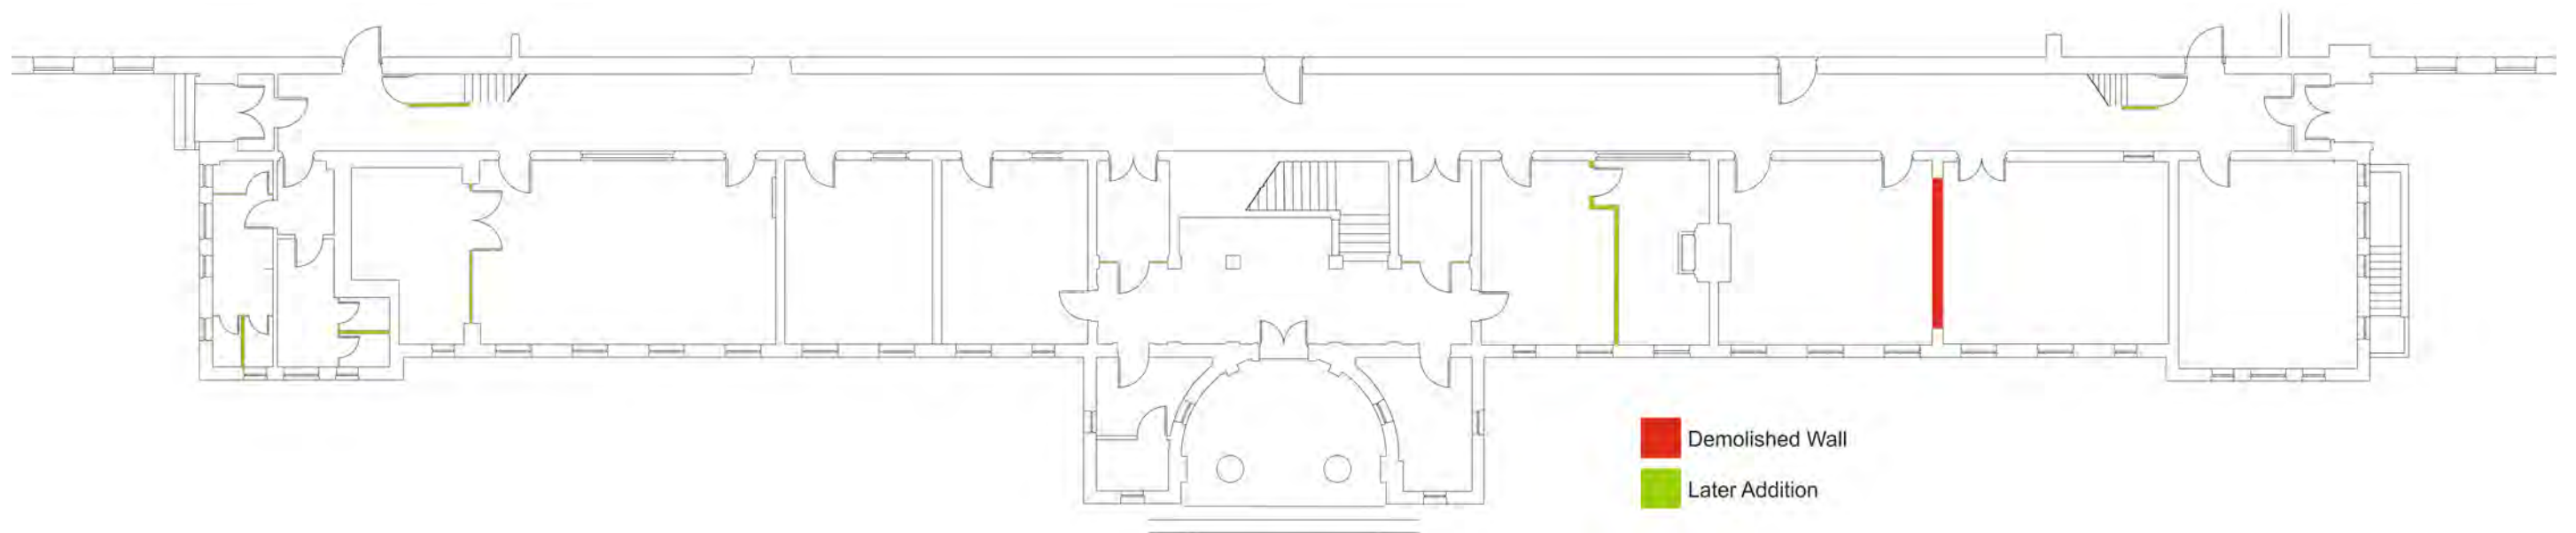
Ground Floor, Added and Demolished Walls, 1:200 @ A3
